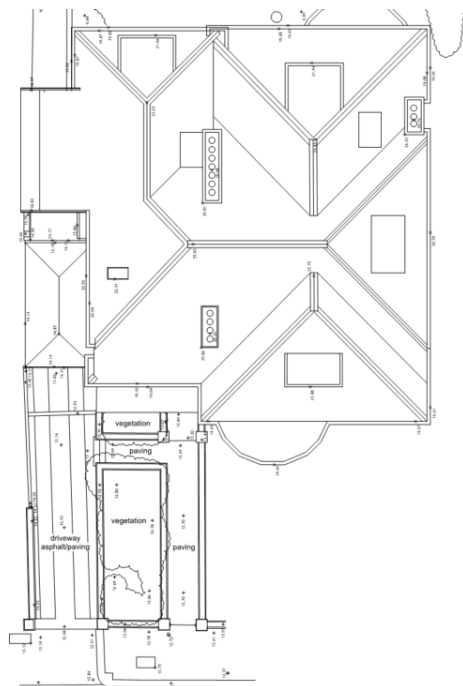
Existing front garden treatment Image 2. Proposed Landscaping details.
